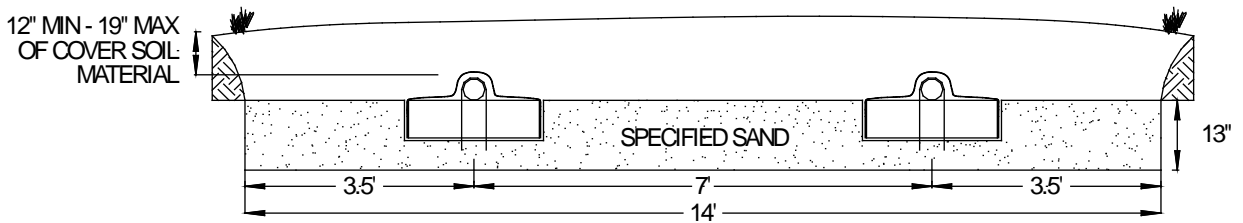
CROSS SECTION VIEW – 600 GPD – A42 – BED SYSTEM – LEVEL SITE
